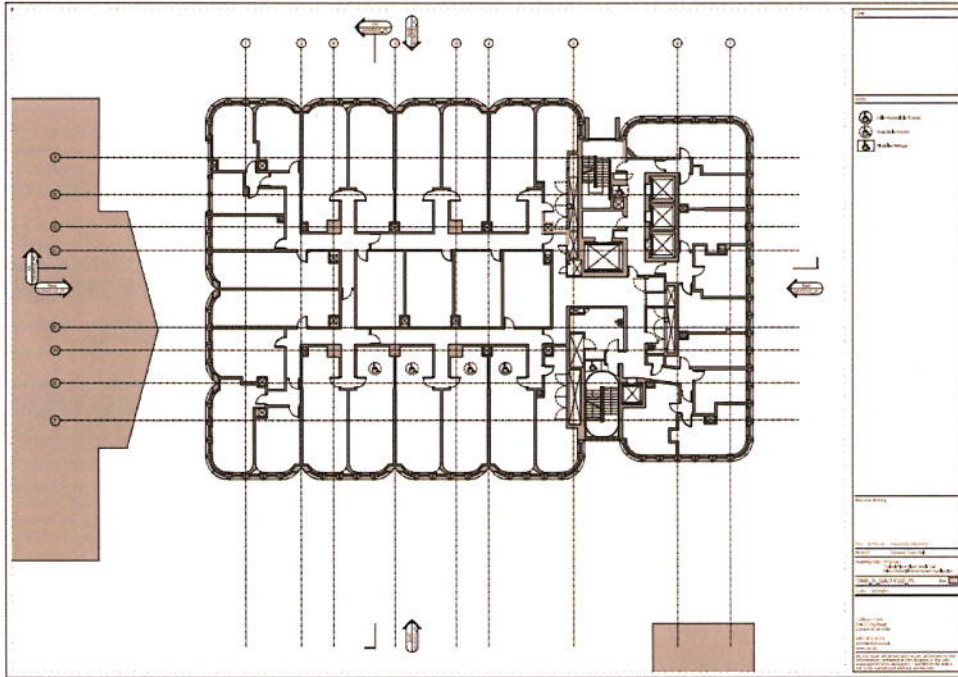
Approved Floorplan showing the hotel rooms in relation to the Camden Centre (Ref: 2016/0410/P)
